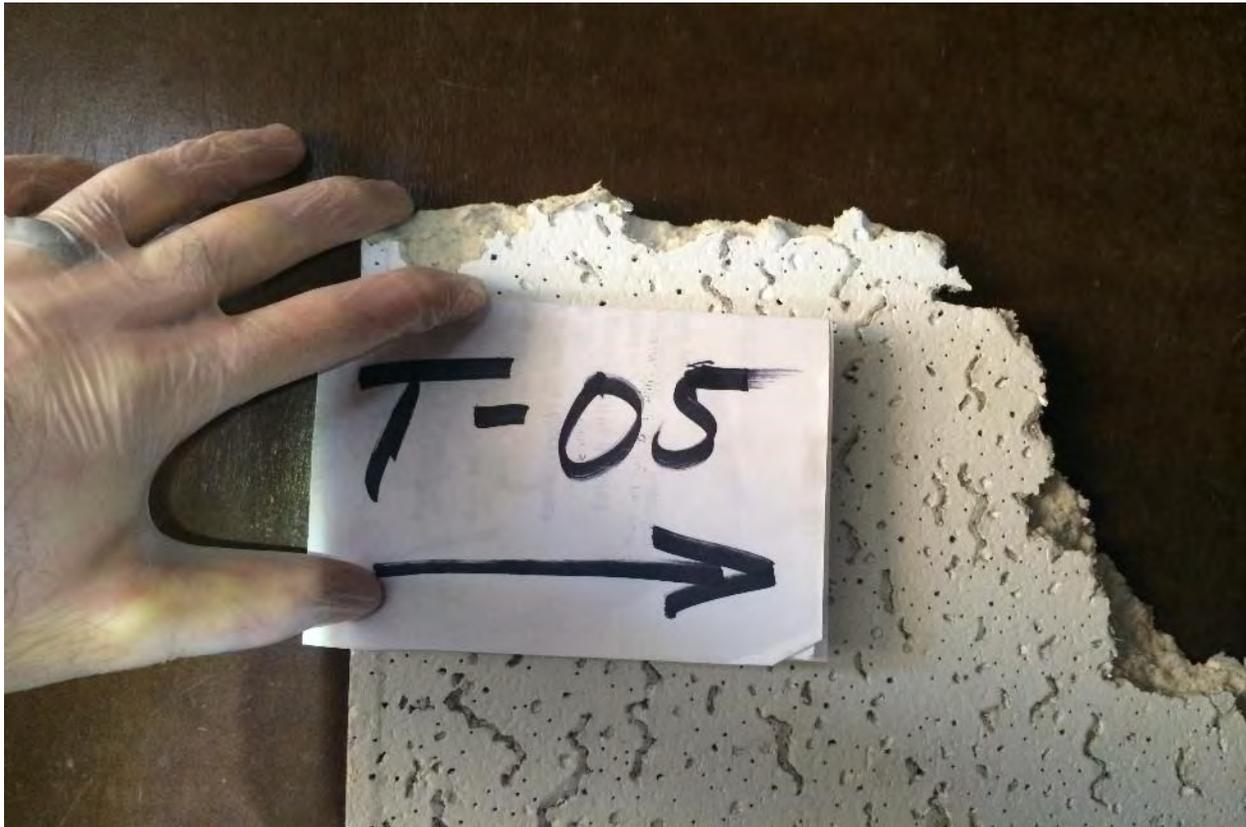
Laboratory analyses detected 2% chrysotile asbestos within suspended ceiling tile sample TS-06 collected from the Theatre Building hallway (sample should be labeled TS-06).
